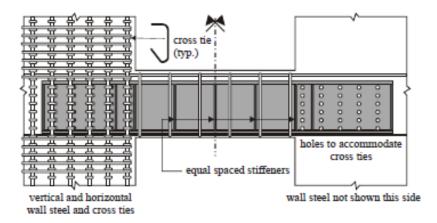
Steel coupling beam (El-Tawil et al., 2007)
